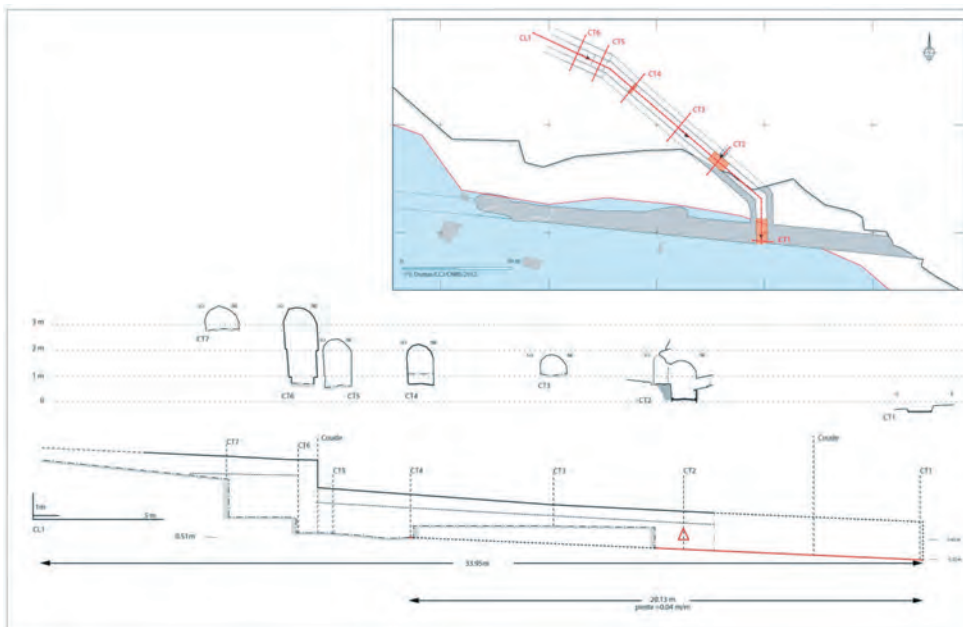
Plan and cross-section of the underground canal/tunnel (drawing V. Dumas, AMU, CNRS)
